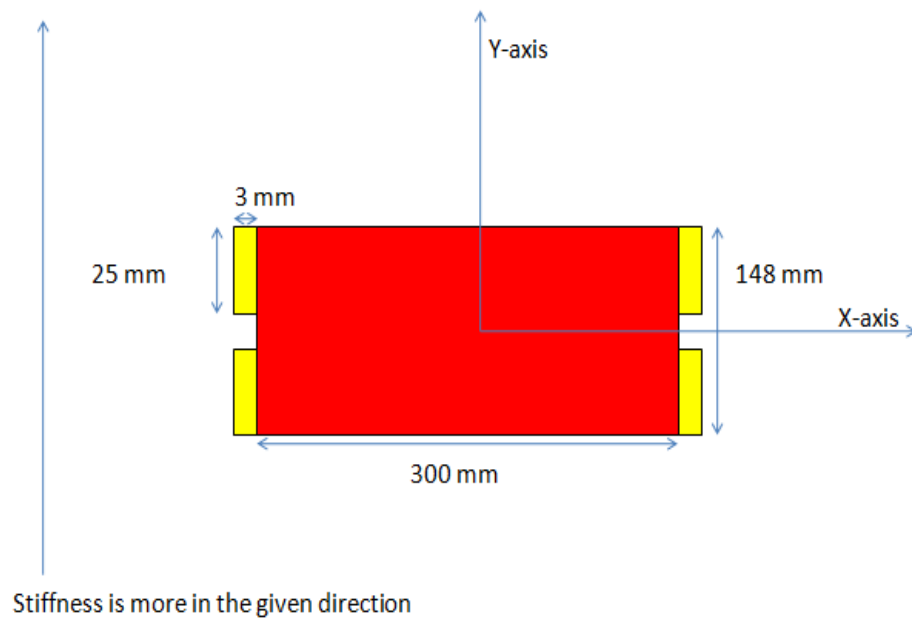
Typical floor plan of the structural model of Aluminum frame
